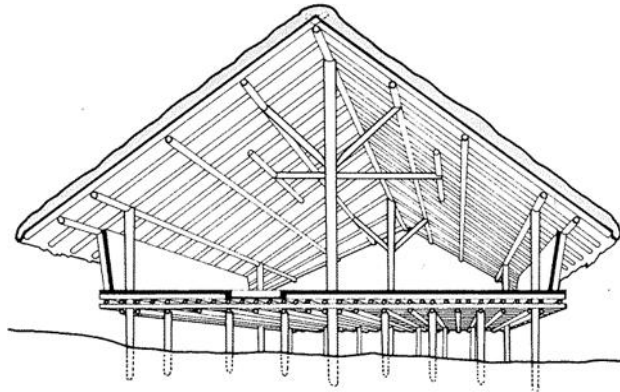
Diagram Indicating the Typical Plan (Source: Wang, Qijun. *Vernacular Dwellings*, p.151 )
